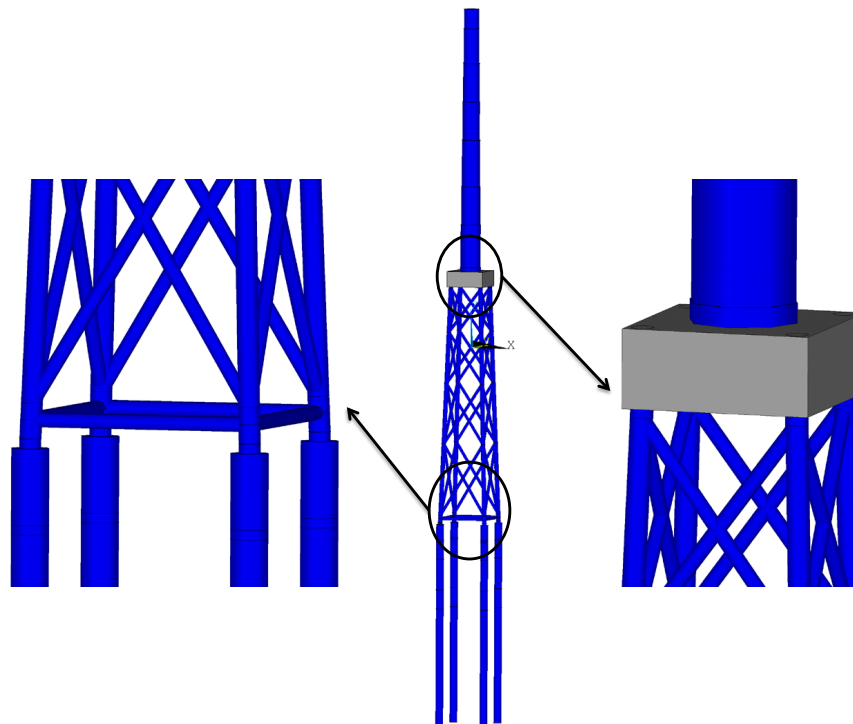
Jacket with tower and piles (middle), detail of concrete TP (right) and lowest bay including pile heads (left).
